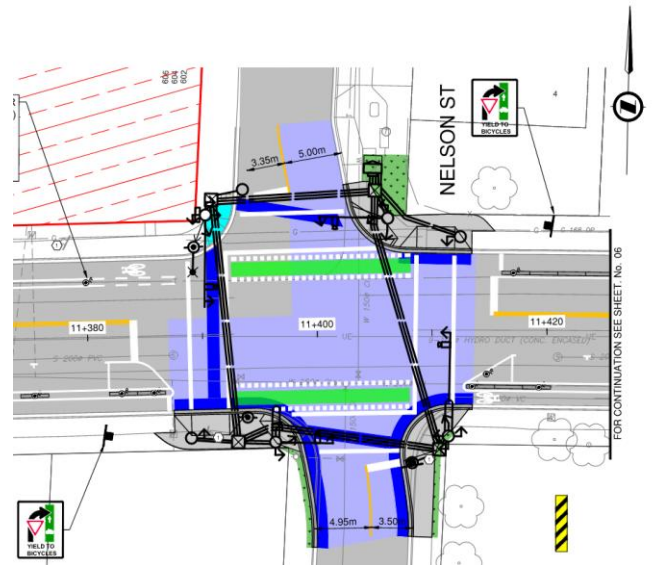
Esquimalt Road & Nelson Street Intersection – Proposed (ISL 2026)
